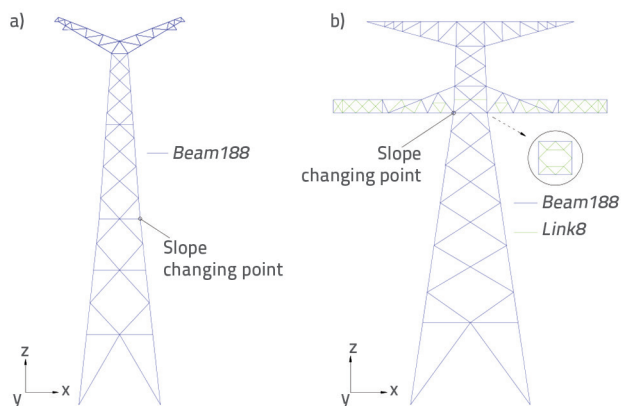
Tangent crossing tower (N2, N3, N4) and tension tower (N1, N5): a) Tangent crossing tower; b) Tension tower
